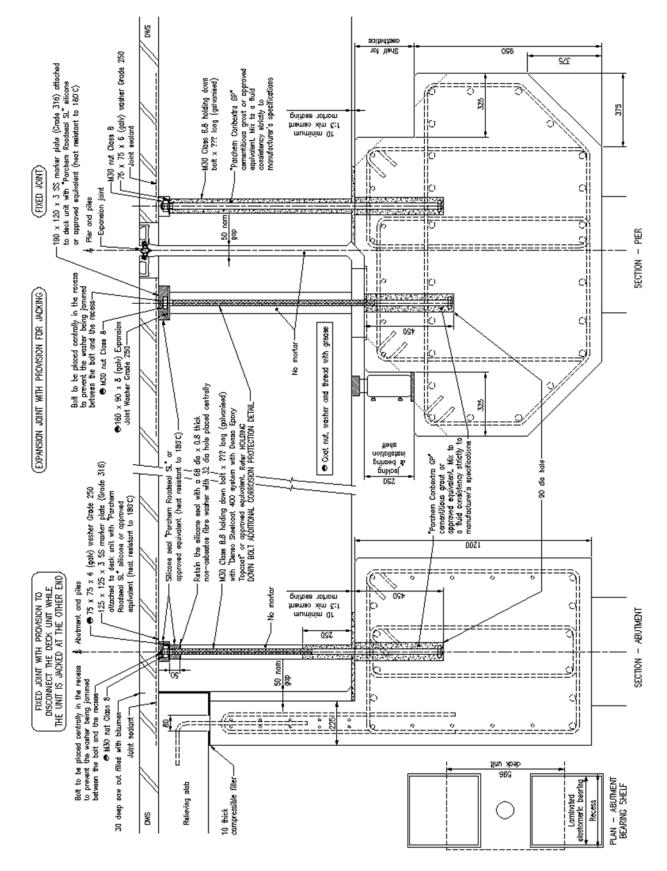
Fixed Abutment Joint and Expansion/Fixed Pier Joint – DWS on Deck Units ≤20 m
